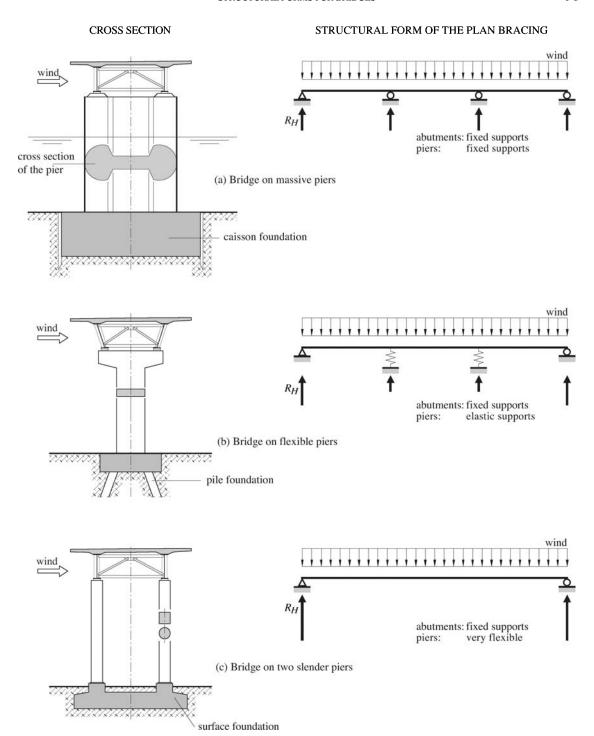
Different plan bracing systems as a function of the transverse stiffness of the piers.
